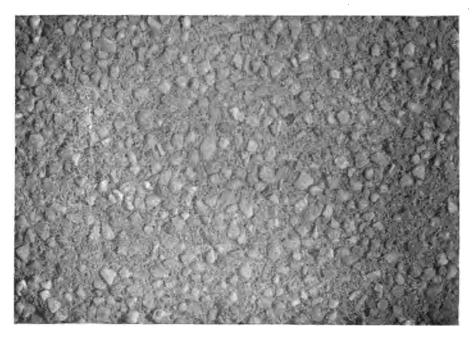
WHITE PEBBLE CONCRETE (NATURAL SIZE).
